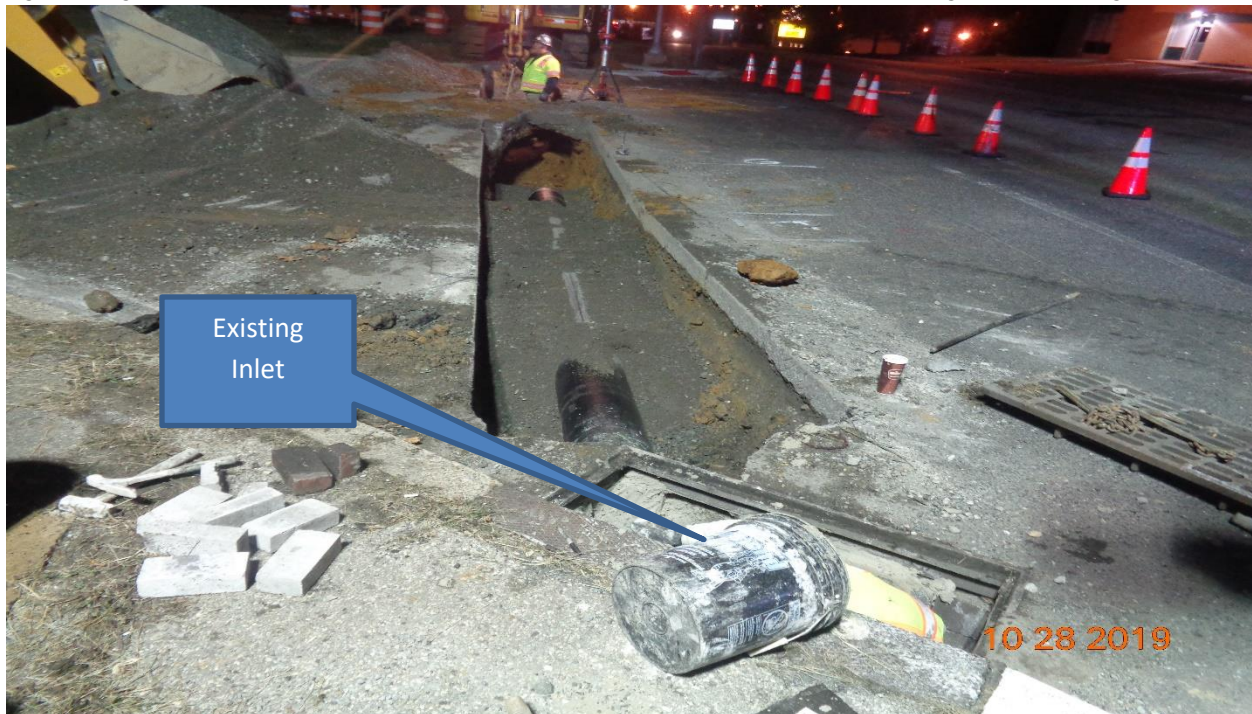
Installation of 12" ductile iron pipe across Derrusse Avenue from existing inlet to existing manhole.
